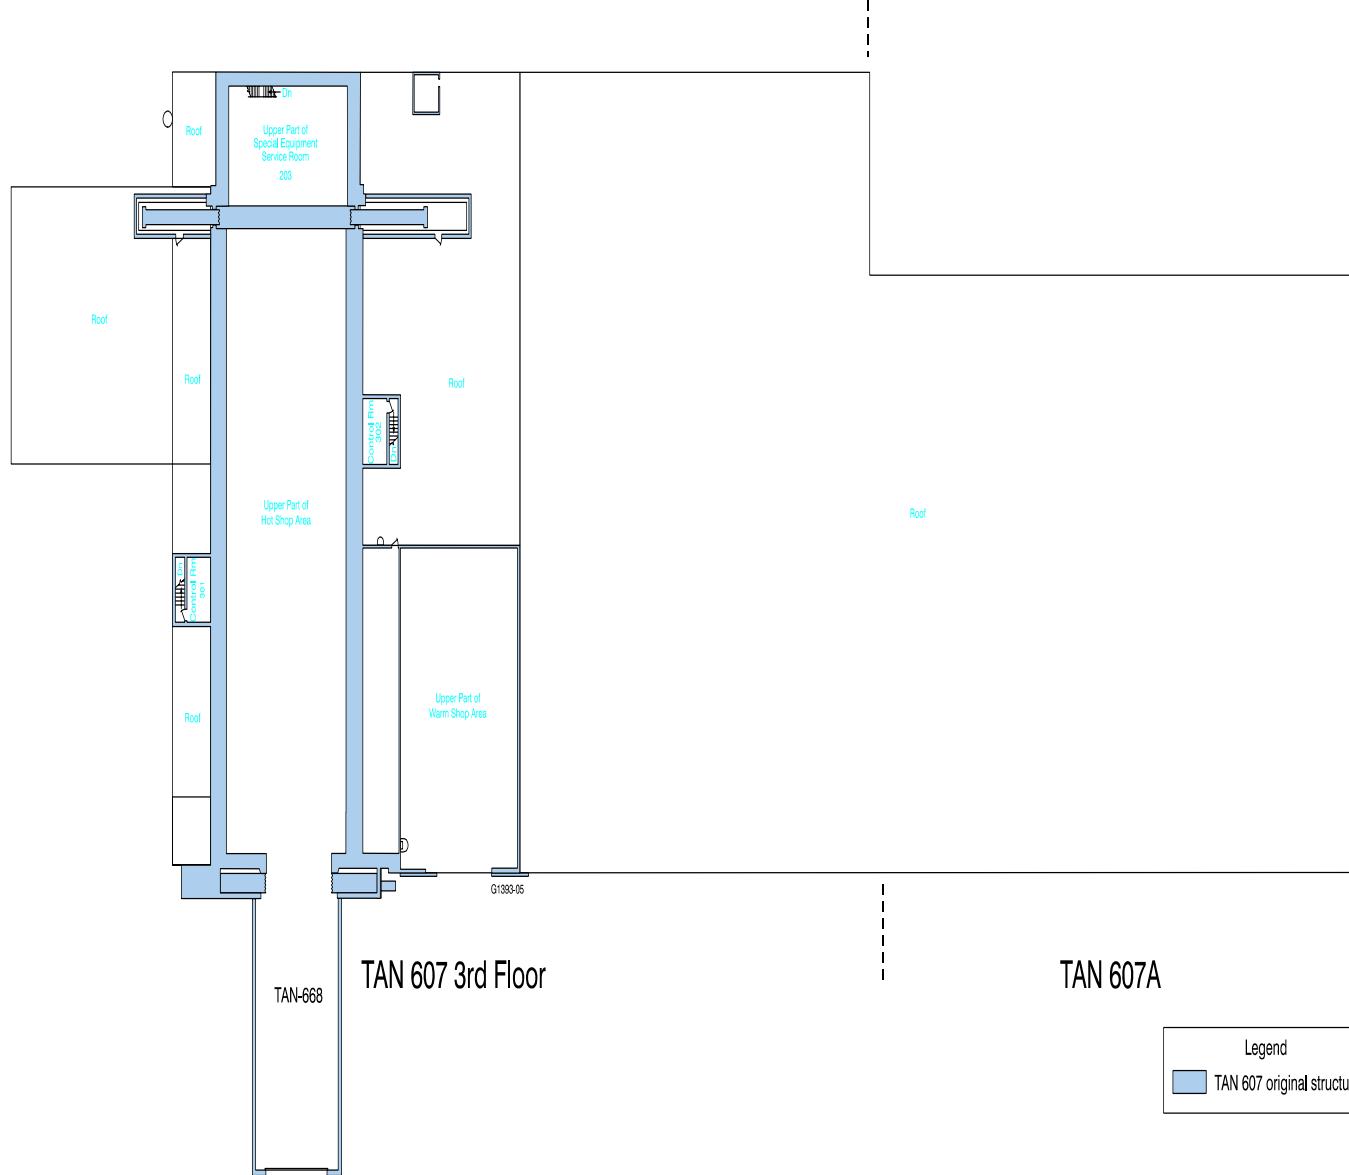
TAN-607 and TAN-607A floor plan, third floor (from Appendix A, EDF-7173).
